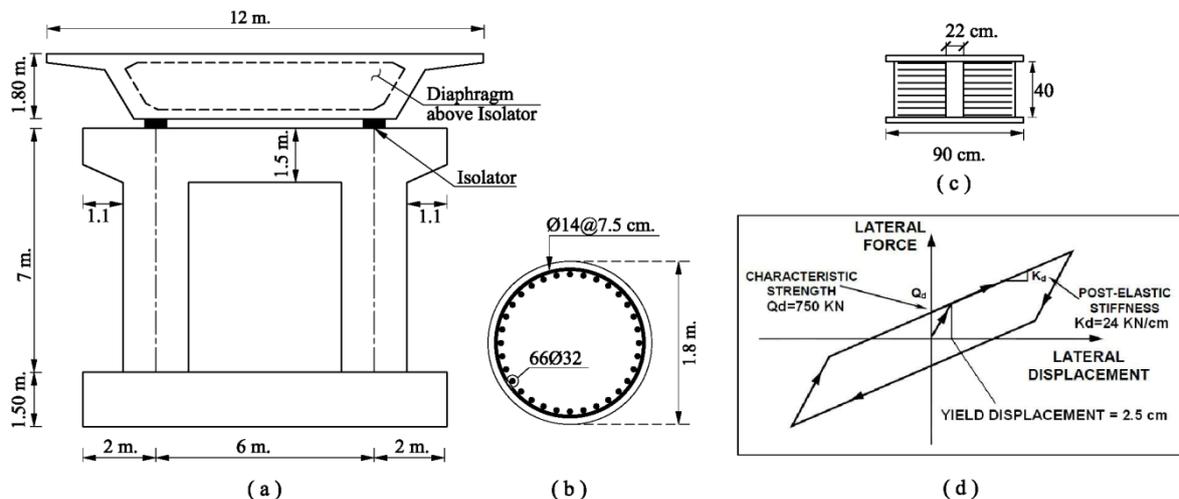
a) Details of transvers section of deck and pier, b) Cross section of piers column, c) Detail of lead rubber bearing, d) Hysteresis model of lateral load-displacement of LRB
